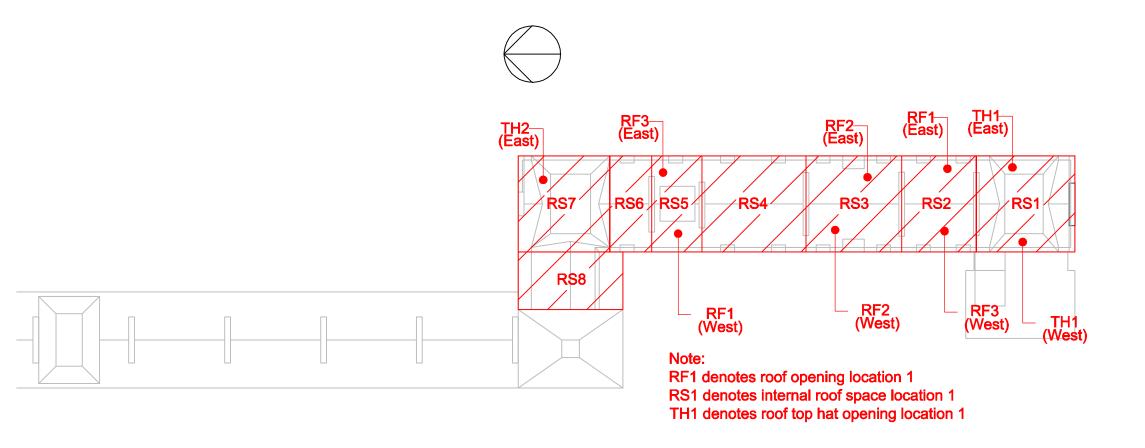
Plan of Station Hotel Building South Block showing Internal Survey Defect/Observation Locations of Roof Space and Roof Openings
